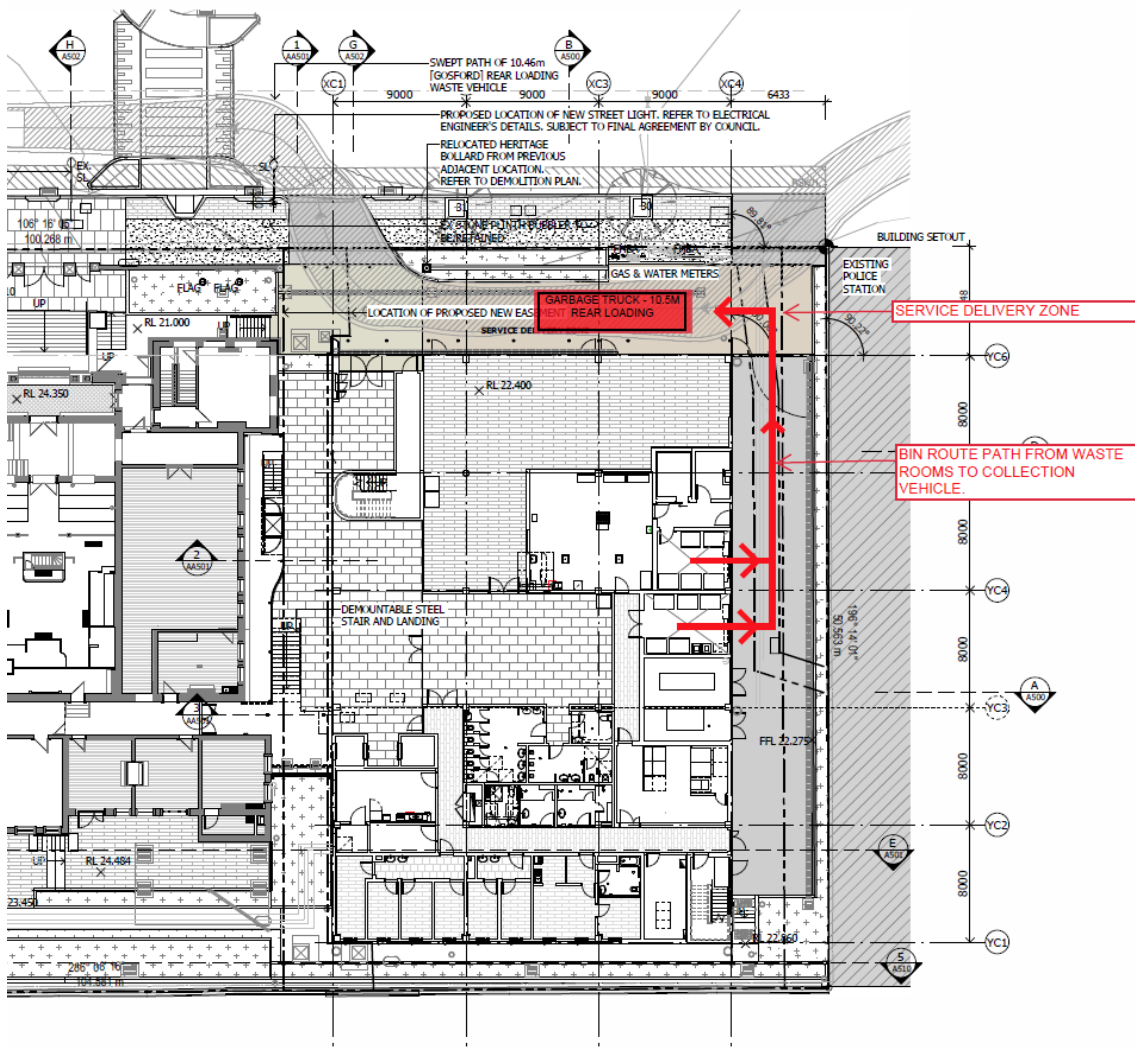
Site Plan illustrating proposed collection point and bin route path - Refer to A035 [Extract Above]
